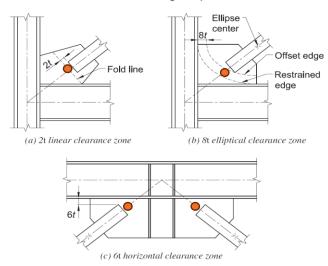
Brace-to-gusset plate requirement for buckling out-of-plane bracing system.
